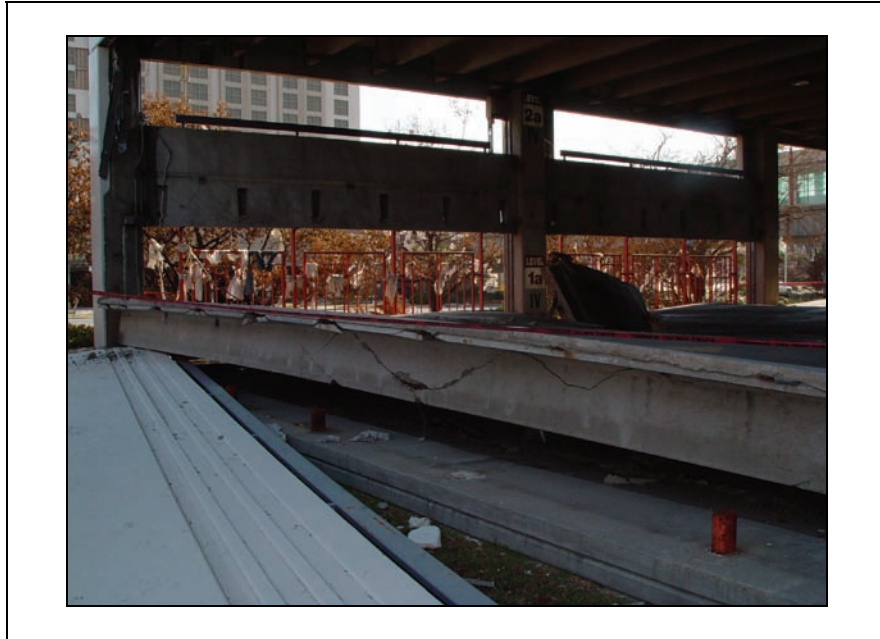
Concrete cover at deck-to-spandrel connections spalled downward, implying that the midspan of the deck moved up.
